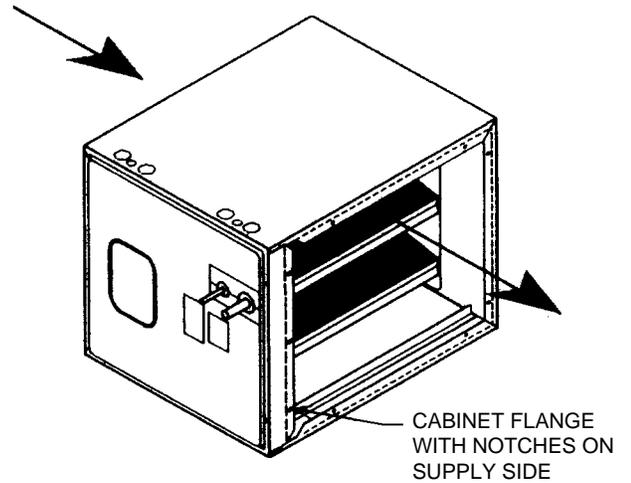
RIGHT-HAND AIR SUPPLY (FRONT CONNECTION COIL SHOWN)
